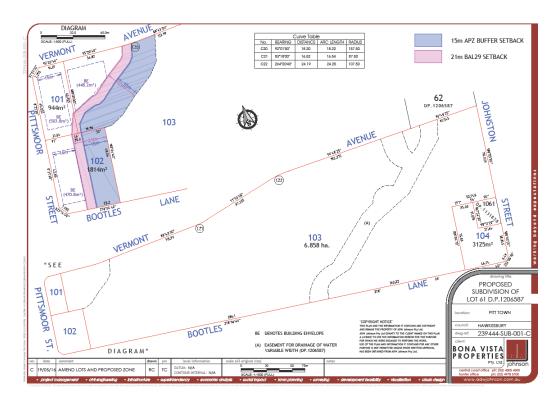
Concept Subdivision Plan (Subject to separate development approval)
